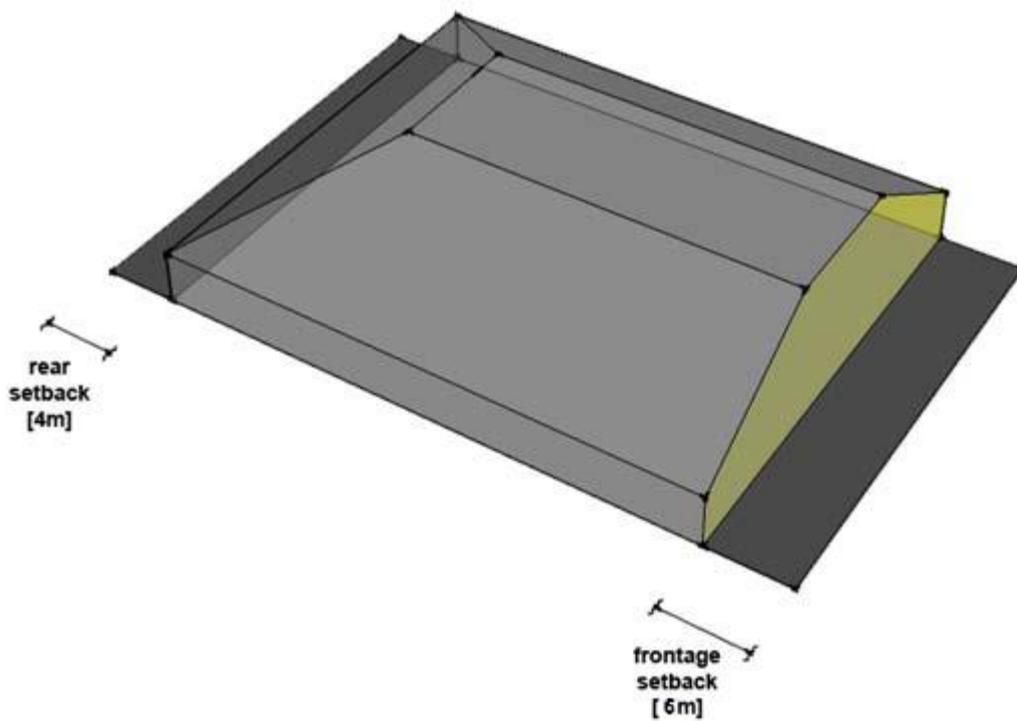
Building envelope required by DOR-P1.6.3 A1(b)
